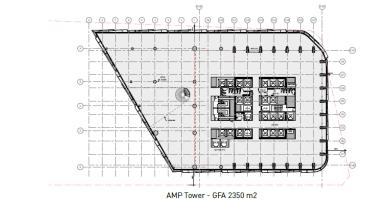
Typical Floor Plates for Commercial Office Towers in Sydney CBD
